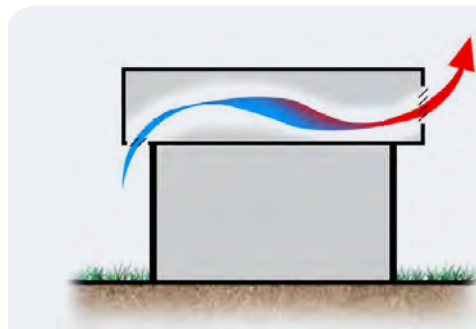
Ventilate roof spaces. Ensure the attic or cathedral roof space is ventilated.
